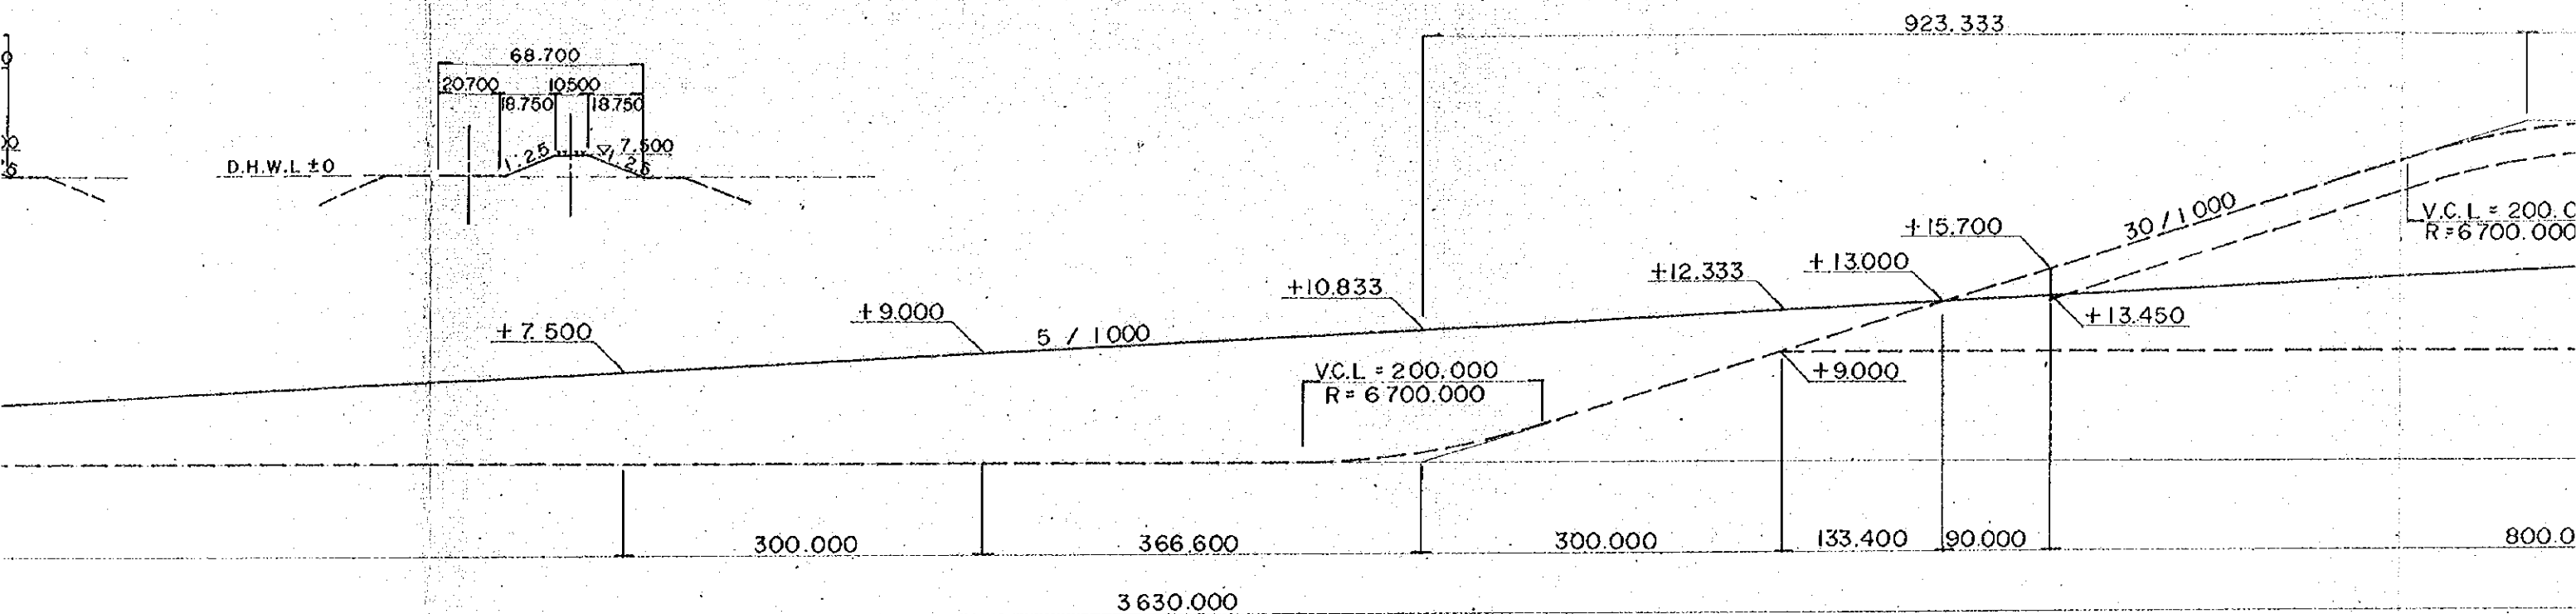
JAMUNA RIVER BRIDGE APPROACH (DOUBLE TRACK RAIL)
